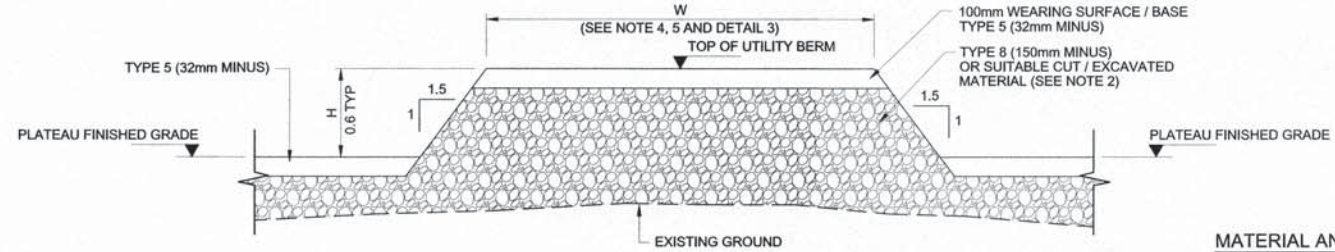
UTILITY BERM AT EDGE OF FINISHED EARTHWORKS SURFACE
